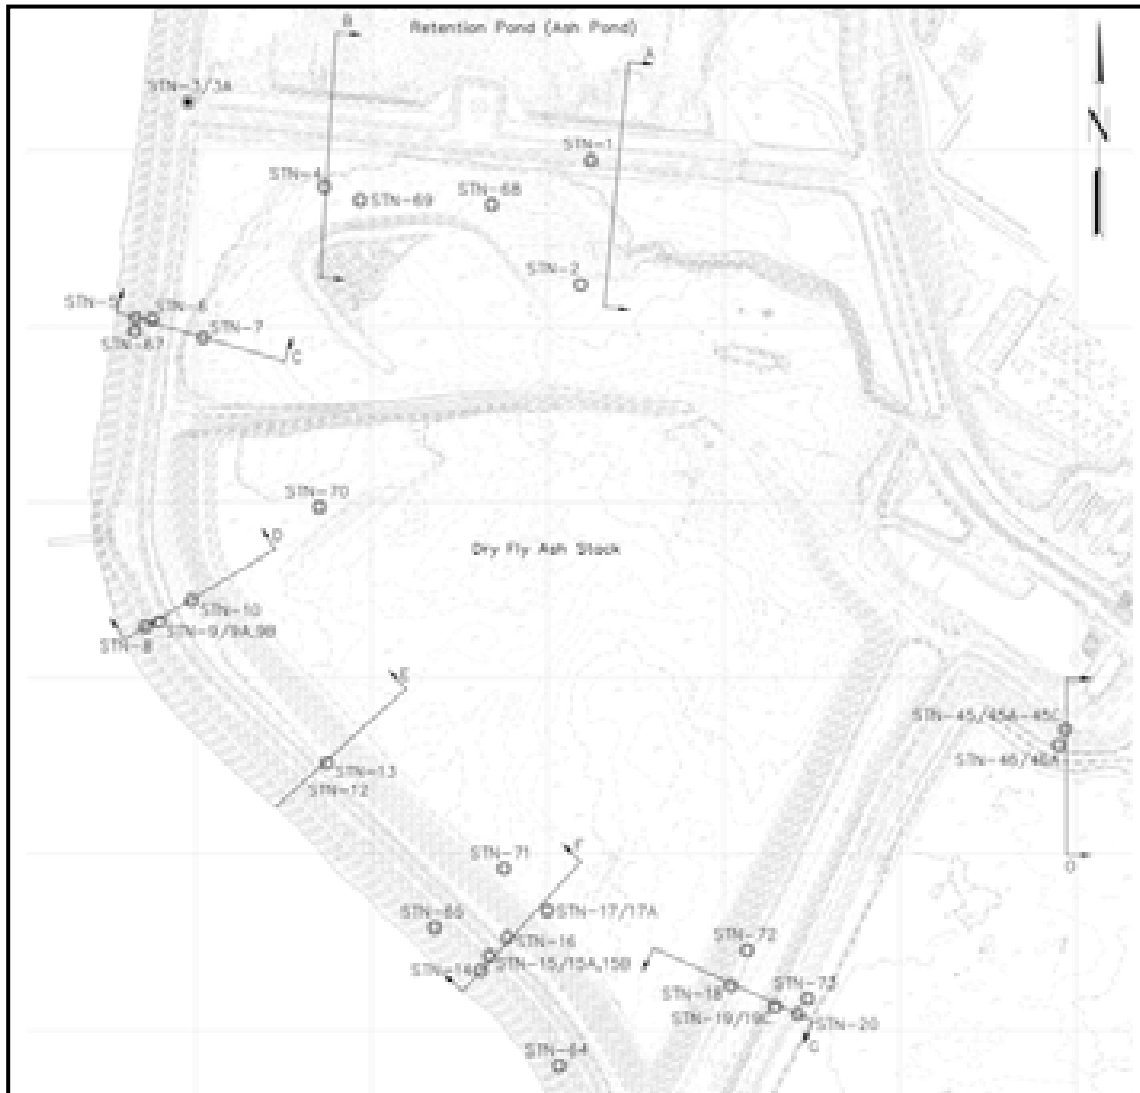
Plan View of the Dry Fly Ash Stack and the Stability Cross-Sections
